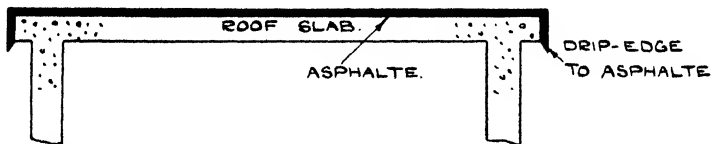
PROVISION OF DRIP EDGES AND SKIRTING TO ROOF OF A SMALL CONCRETE BUILDING
